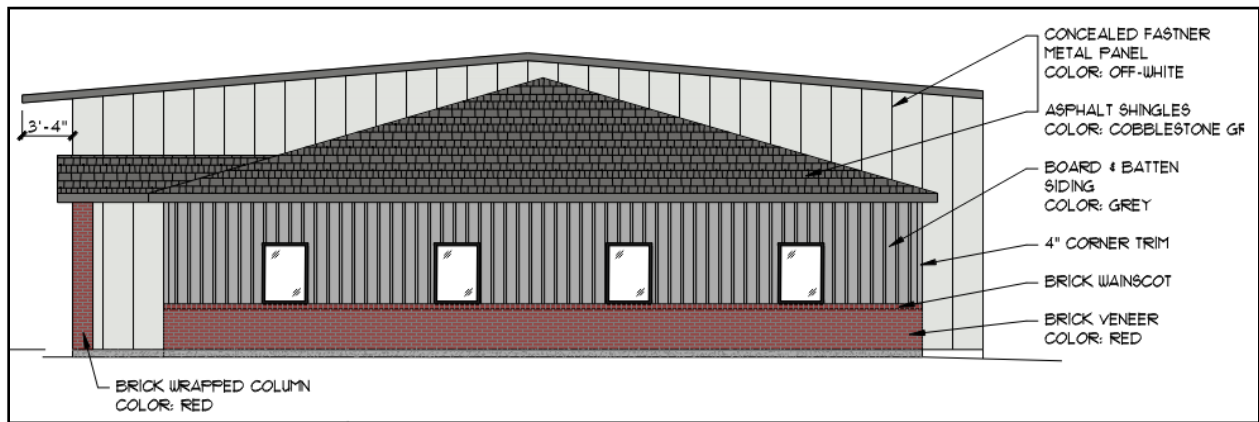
Screenshot of Proposed North Elevation (Facing Elm Point Industrial Drive).
